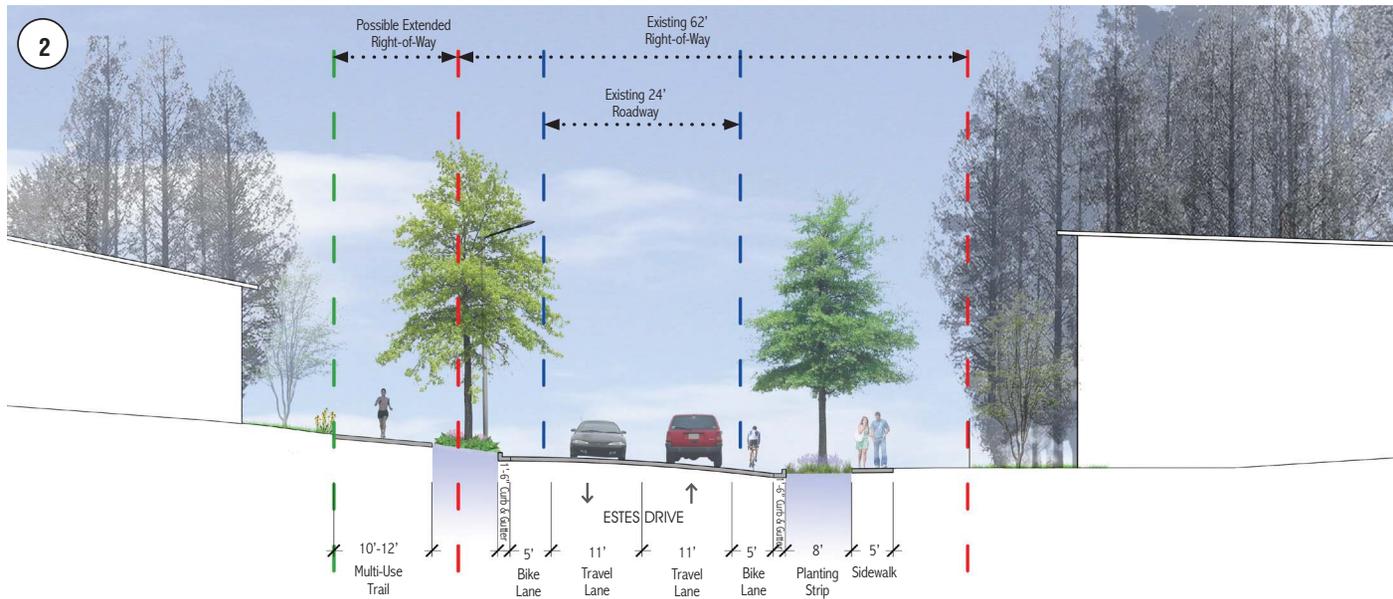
Estes Drive Cross-Section: Residential Area (Looking East)
